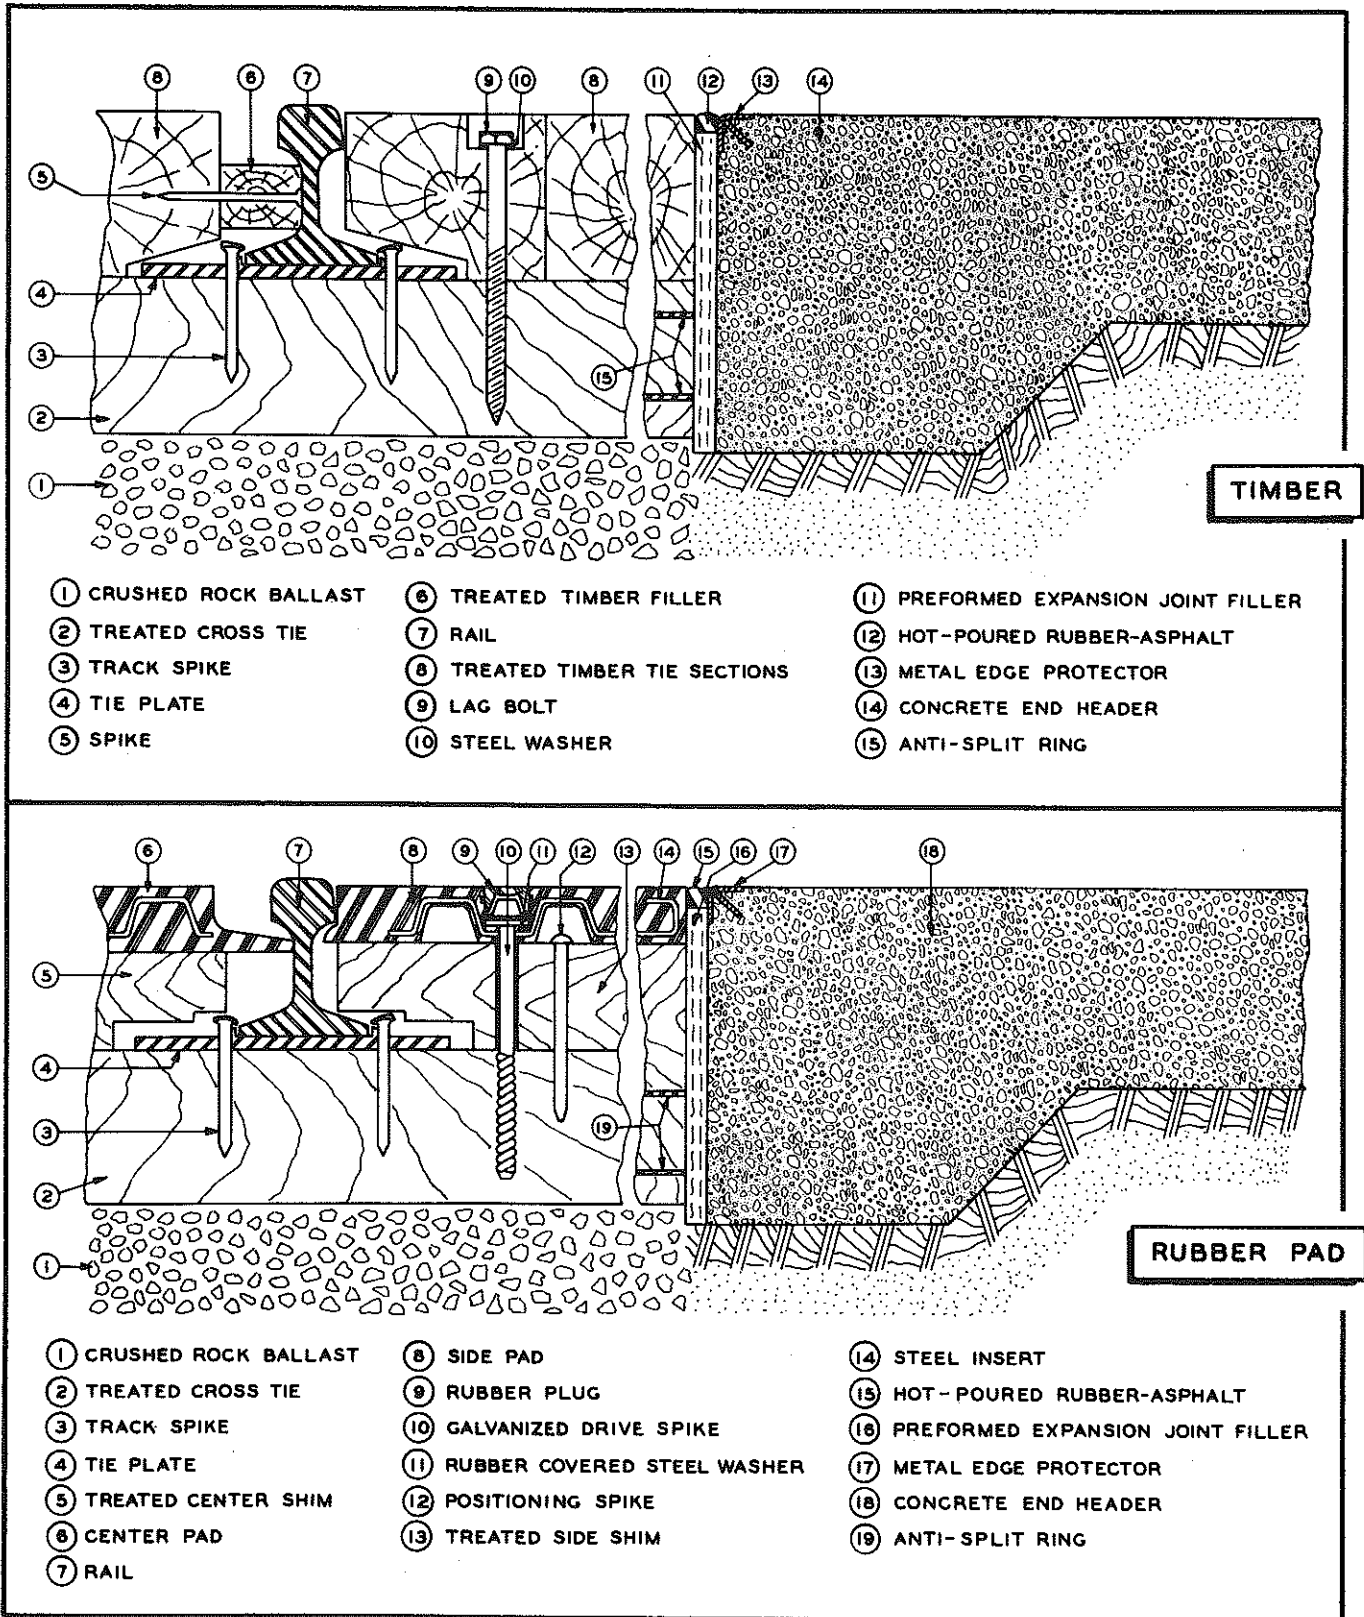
Cross-sectional detail drawings of railroad crossing components.
